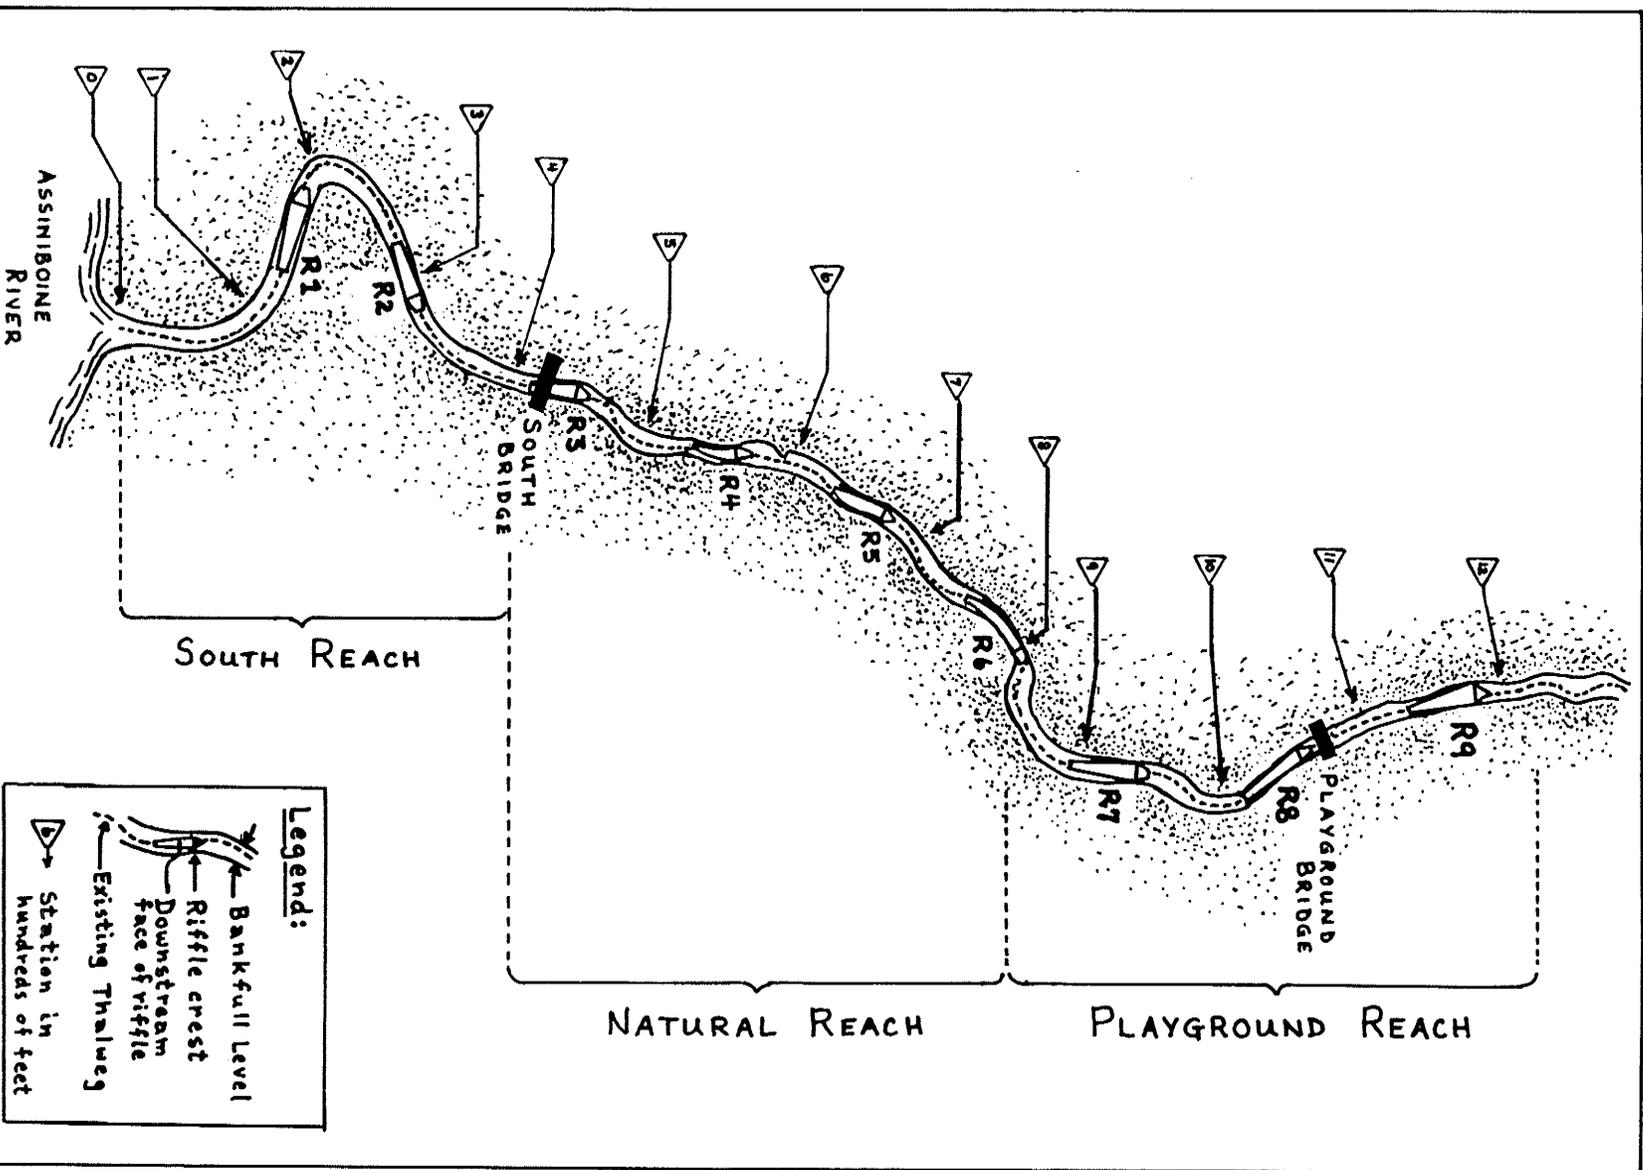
Plan view of proposed pool and riffle system for Truro Creek in Bruce Park.
